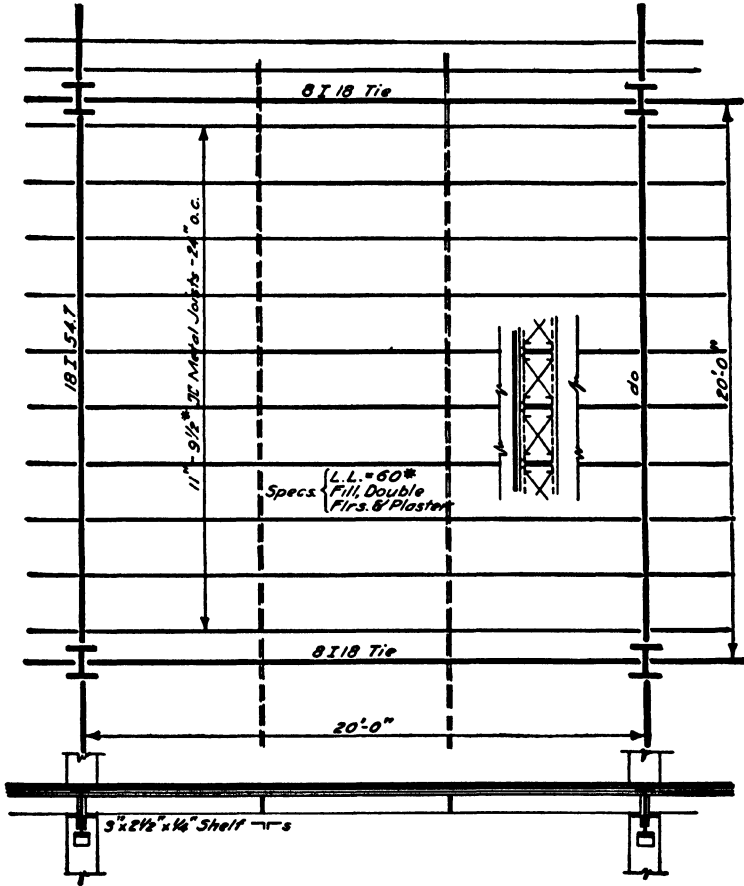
Framing for Steel Joist in Steel Frame.
